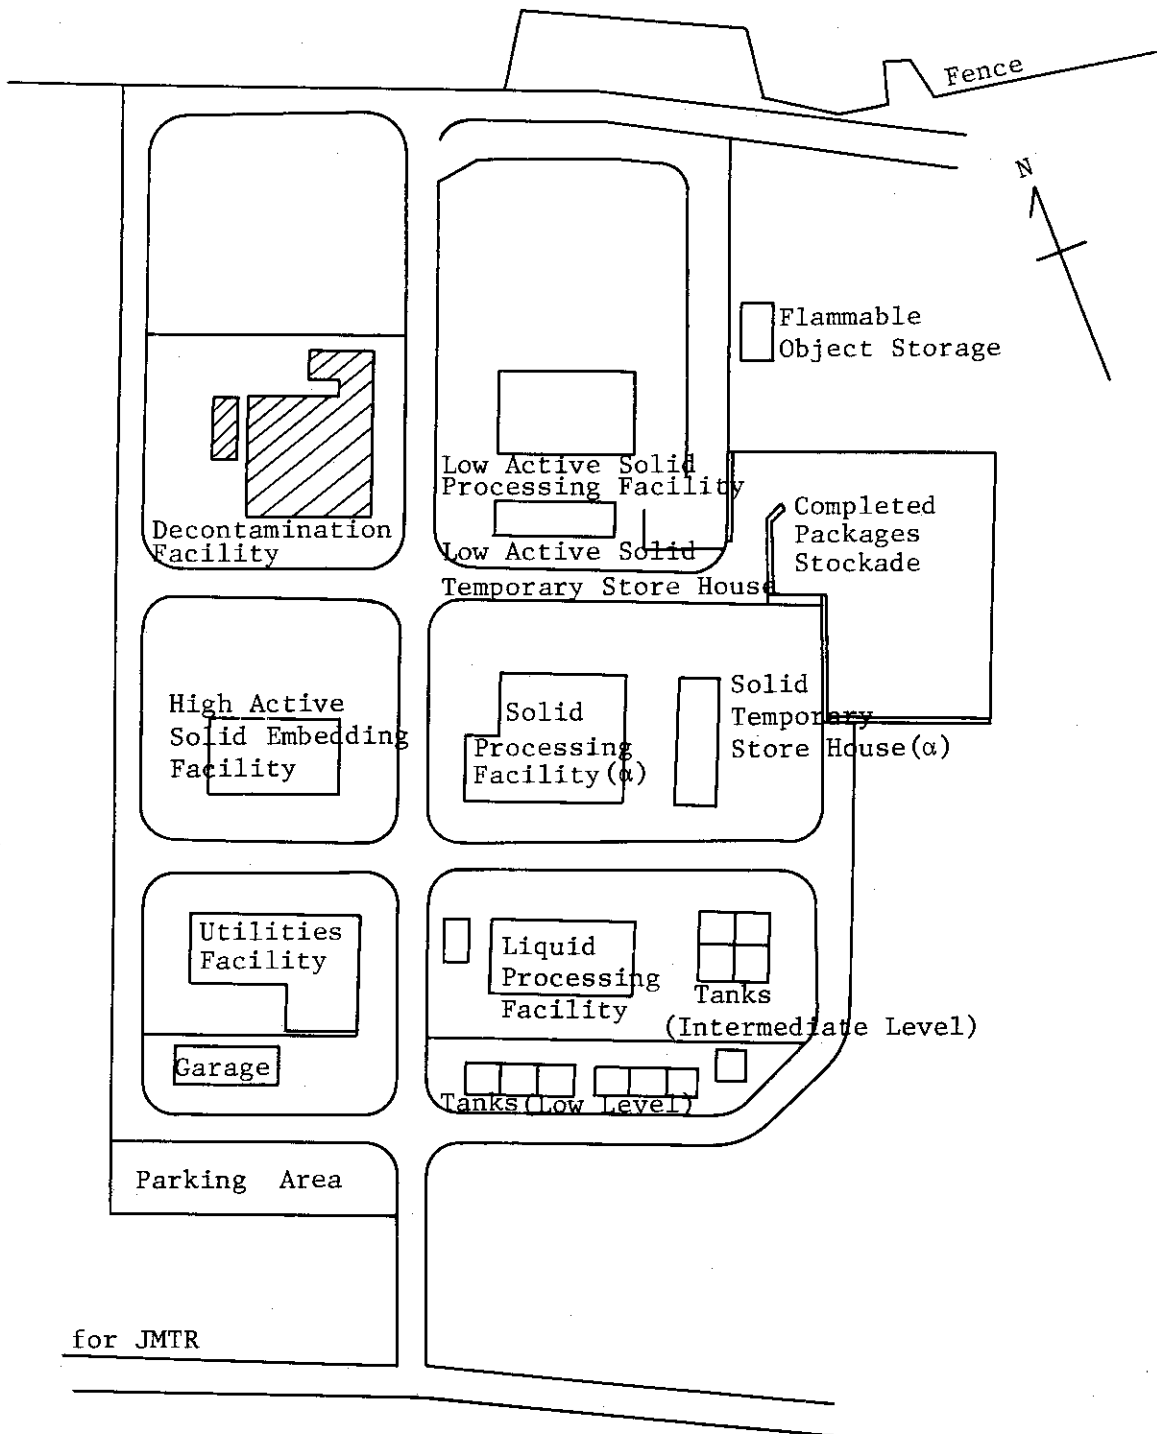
Plot in radioactive waste treatment area and decontamination facility
